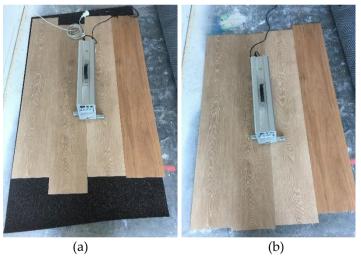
Testing on the (a) Skyline Luxury Vinyl Flooring sample + 3mm Rubber underlay, and (b) Luxury Vinyl Flooring installed in the living area of Unit 706
